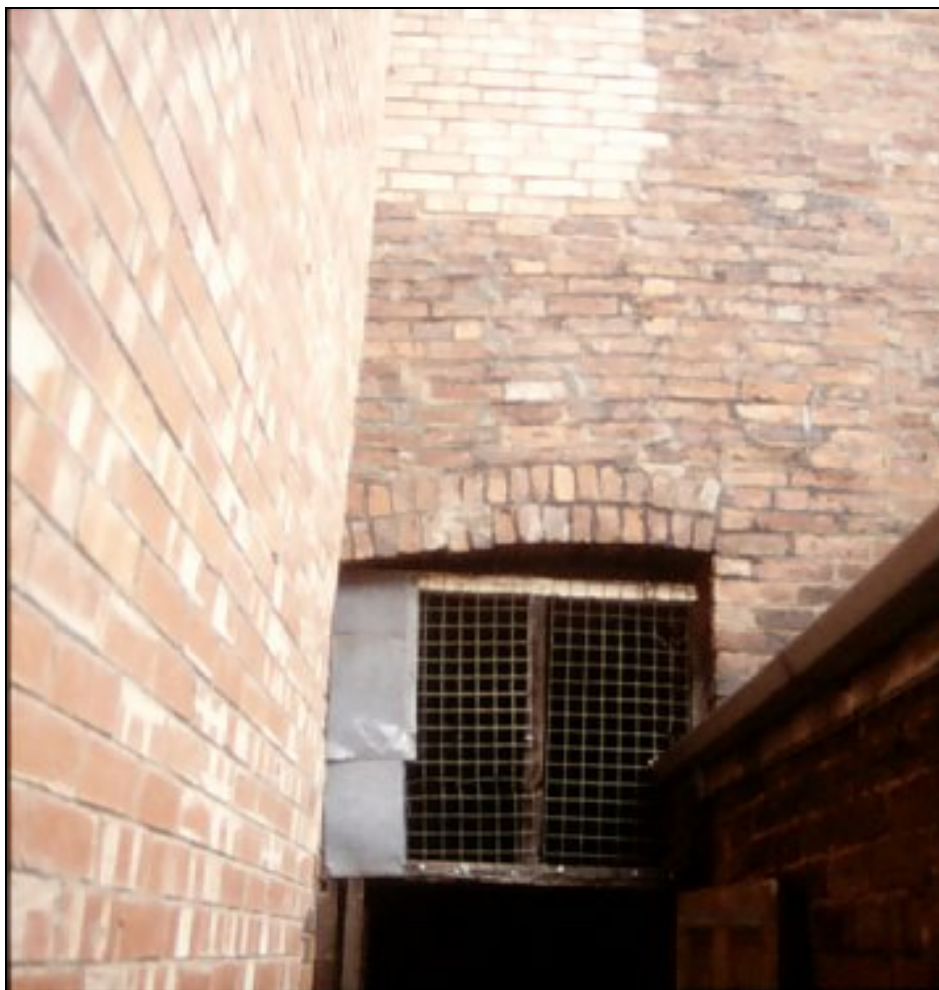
Settlement and rebuilding of the passageway arch of number 22.
